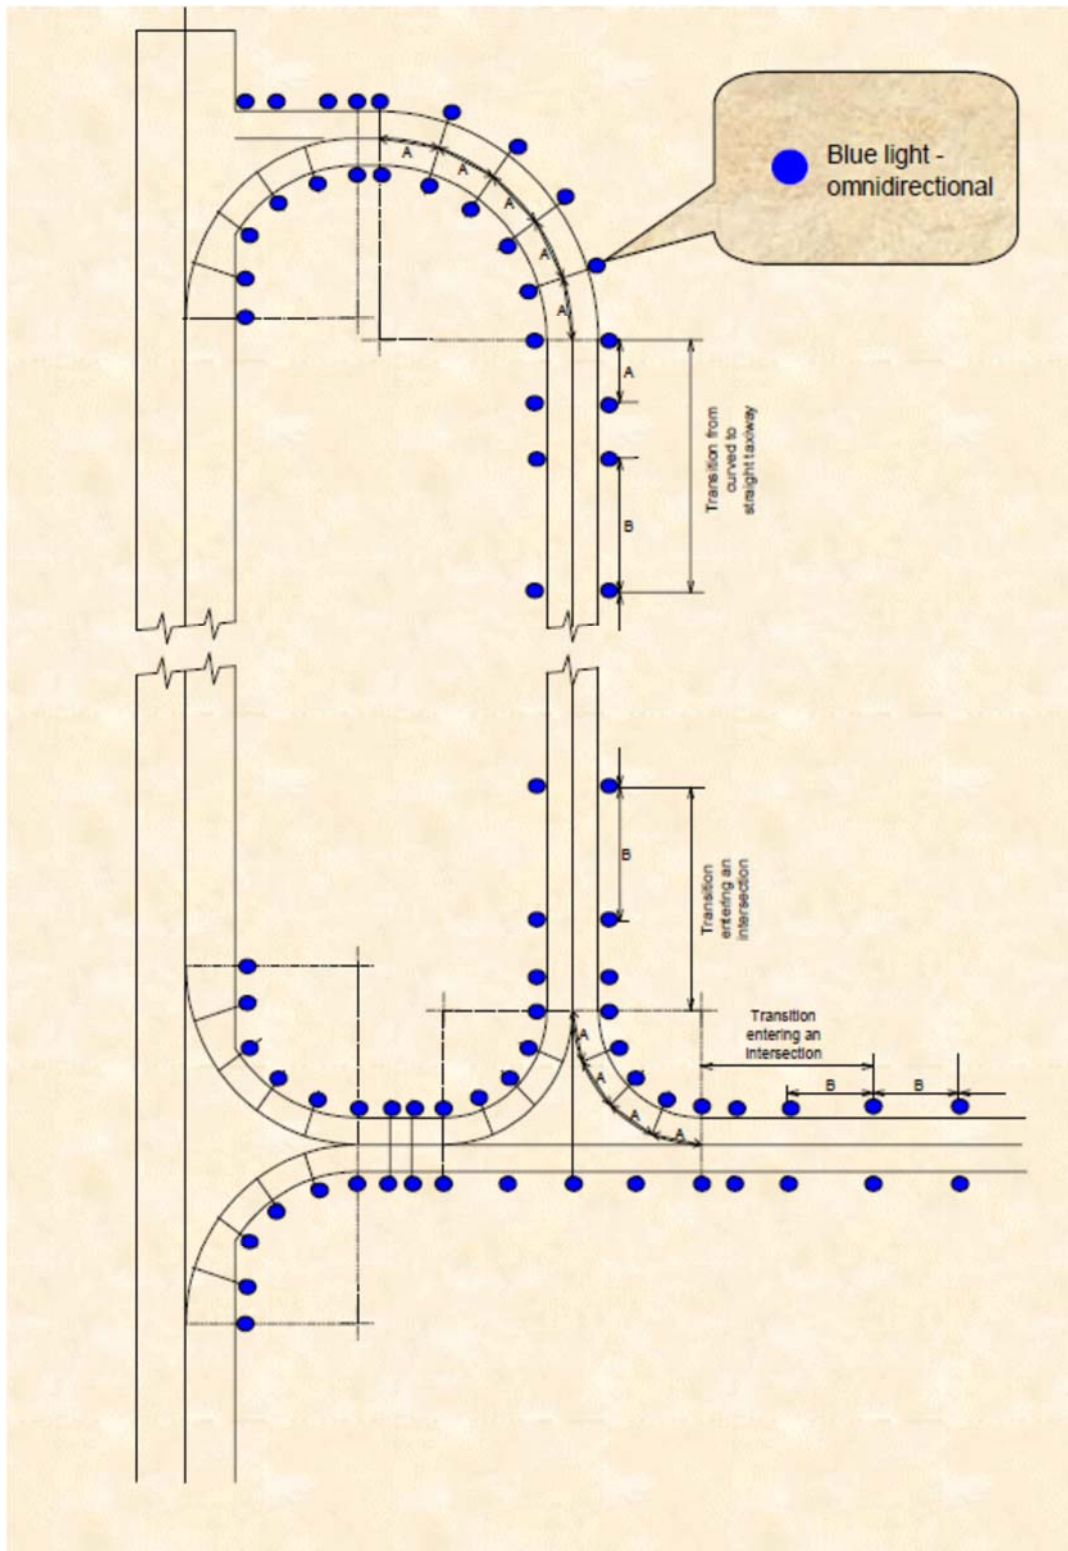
Typical Taxiway Edge Lights Layout
